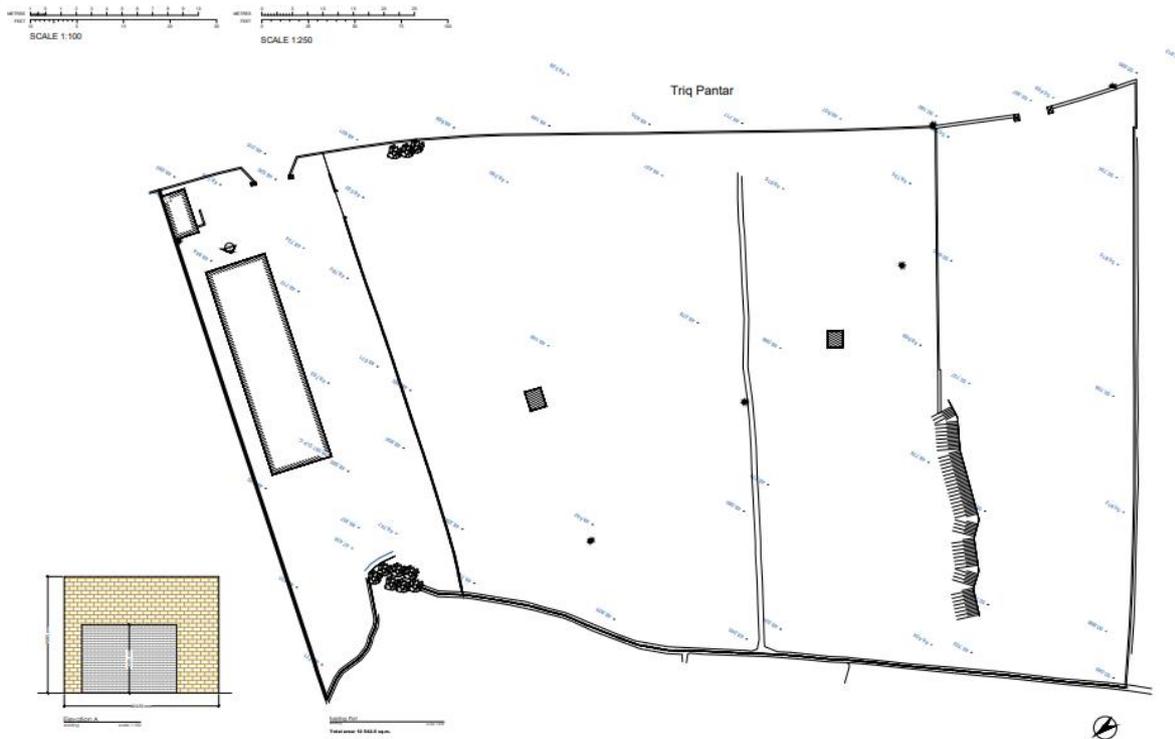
Existing plan (Source: PA/02454/19 – 1c)
